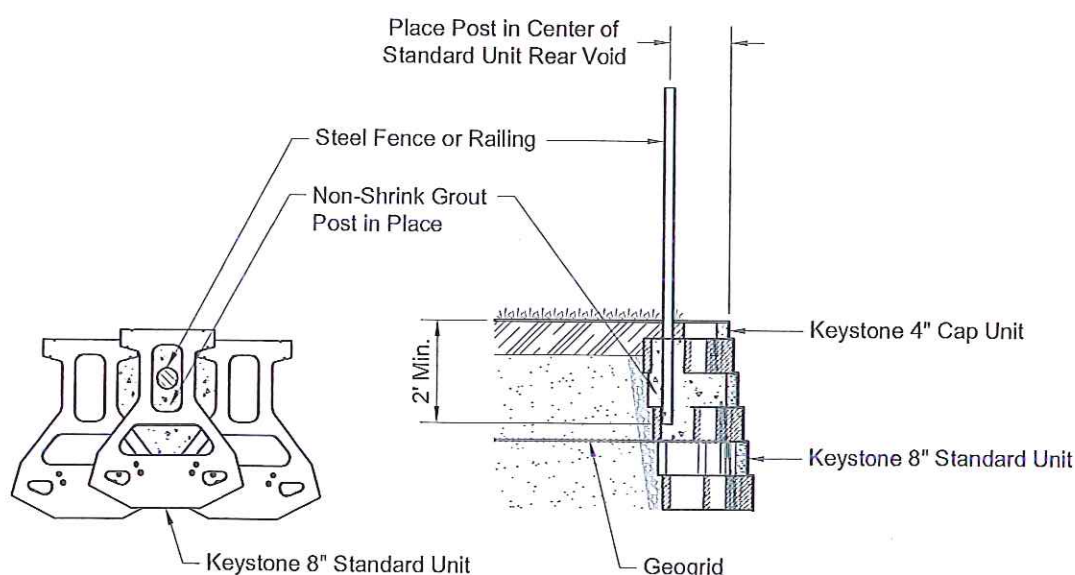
DIRECT MOUNT RAILING IN STANDARD UNIT WALL - 1" SETBACK
